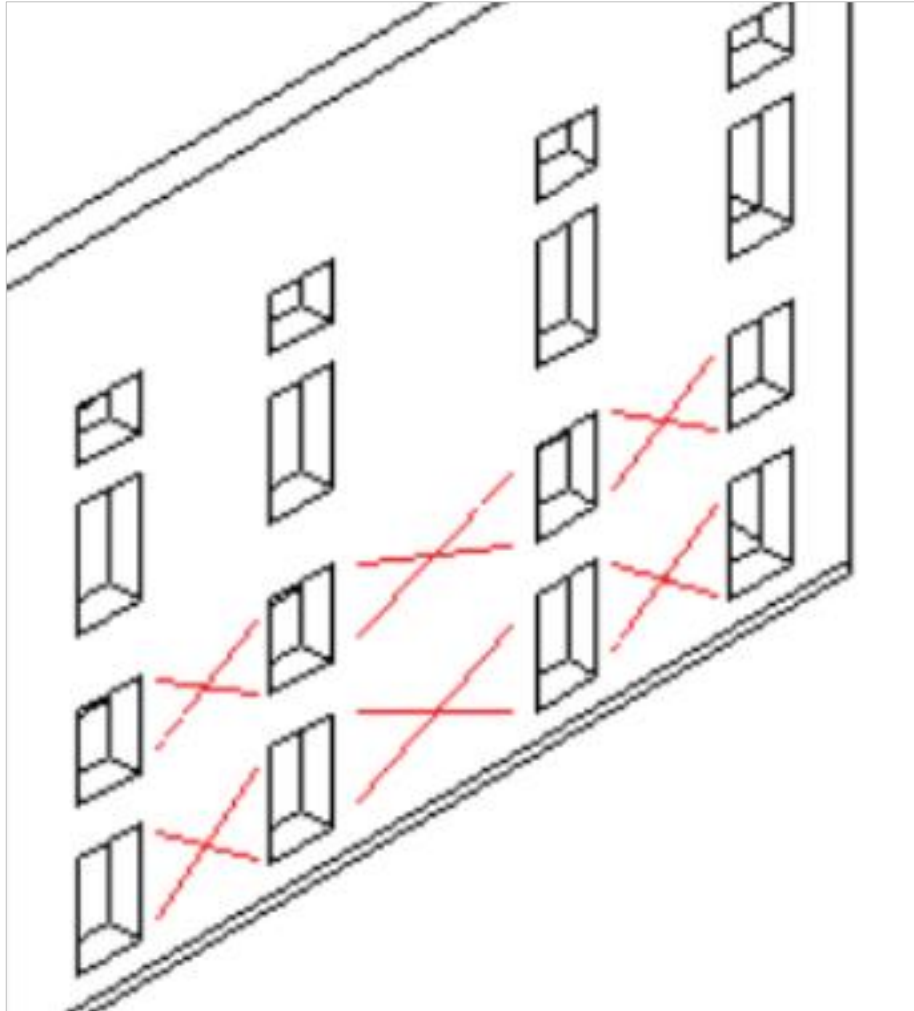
Schematic representation of diagonal shear cracking of piers
